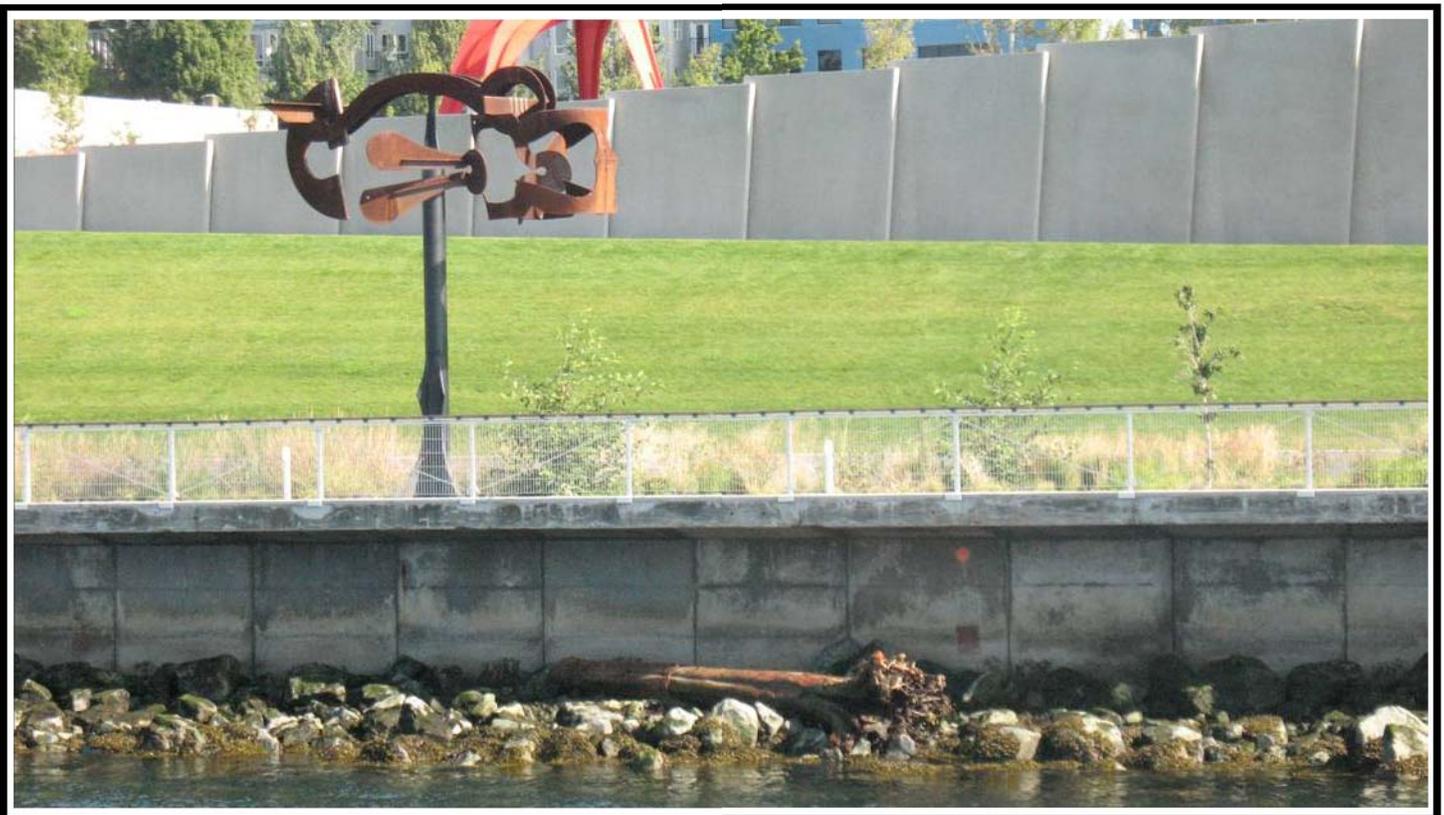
Olympic Sculpture Park and seawall as seen from Pier 70.
